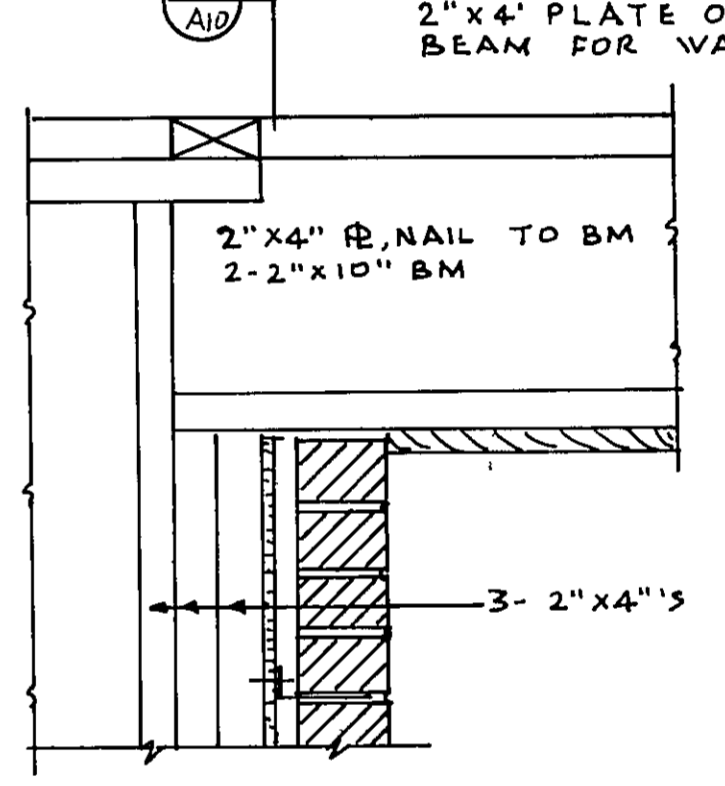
DETAIL OF ANCHOR WITH INTERIOR PARTITION PARALLEL TO TRUSSES
